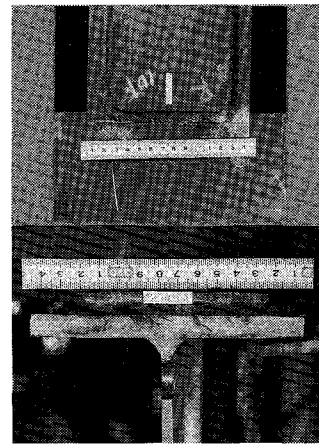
Fatigue Crack in Cover Plate Joint.
